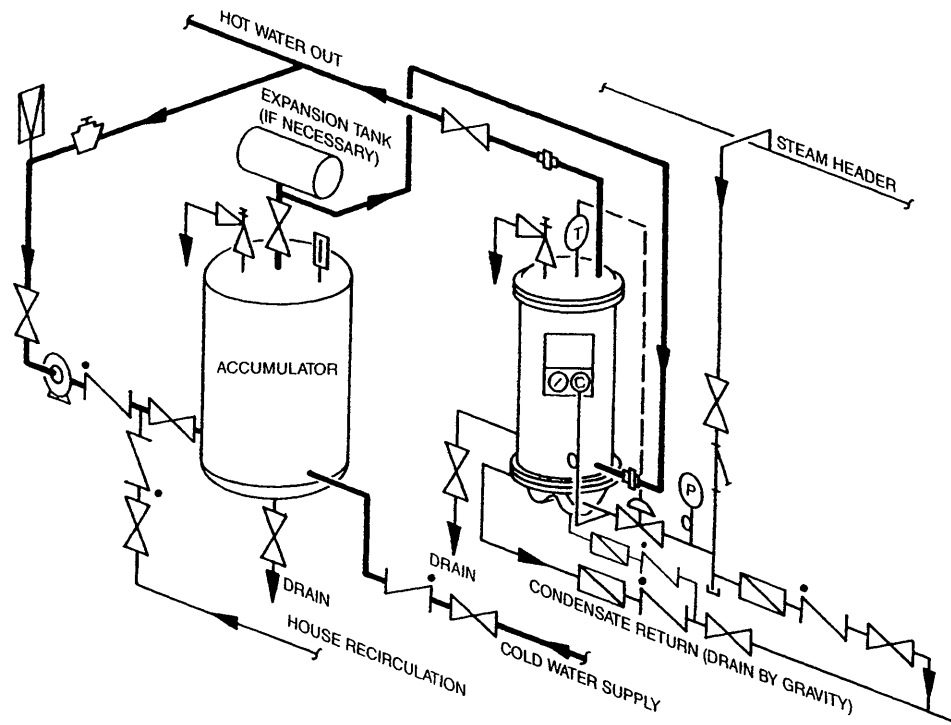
Piping Connections for a Single Steam to Water Heater with an Accumulator
